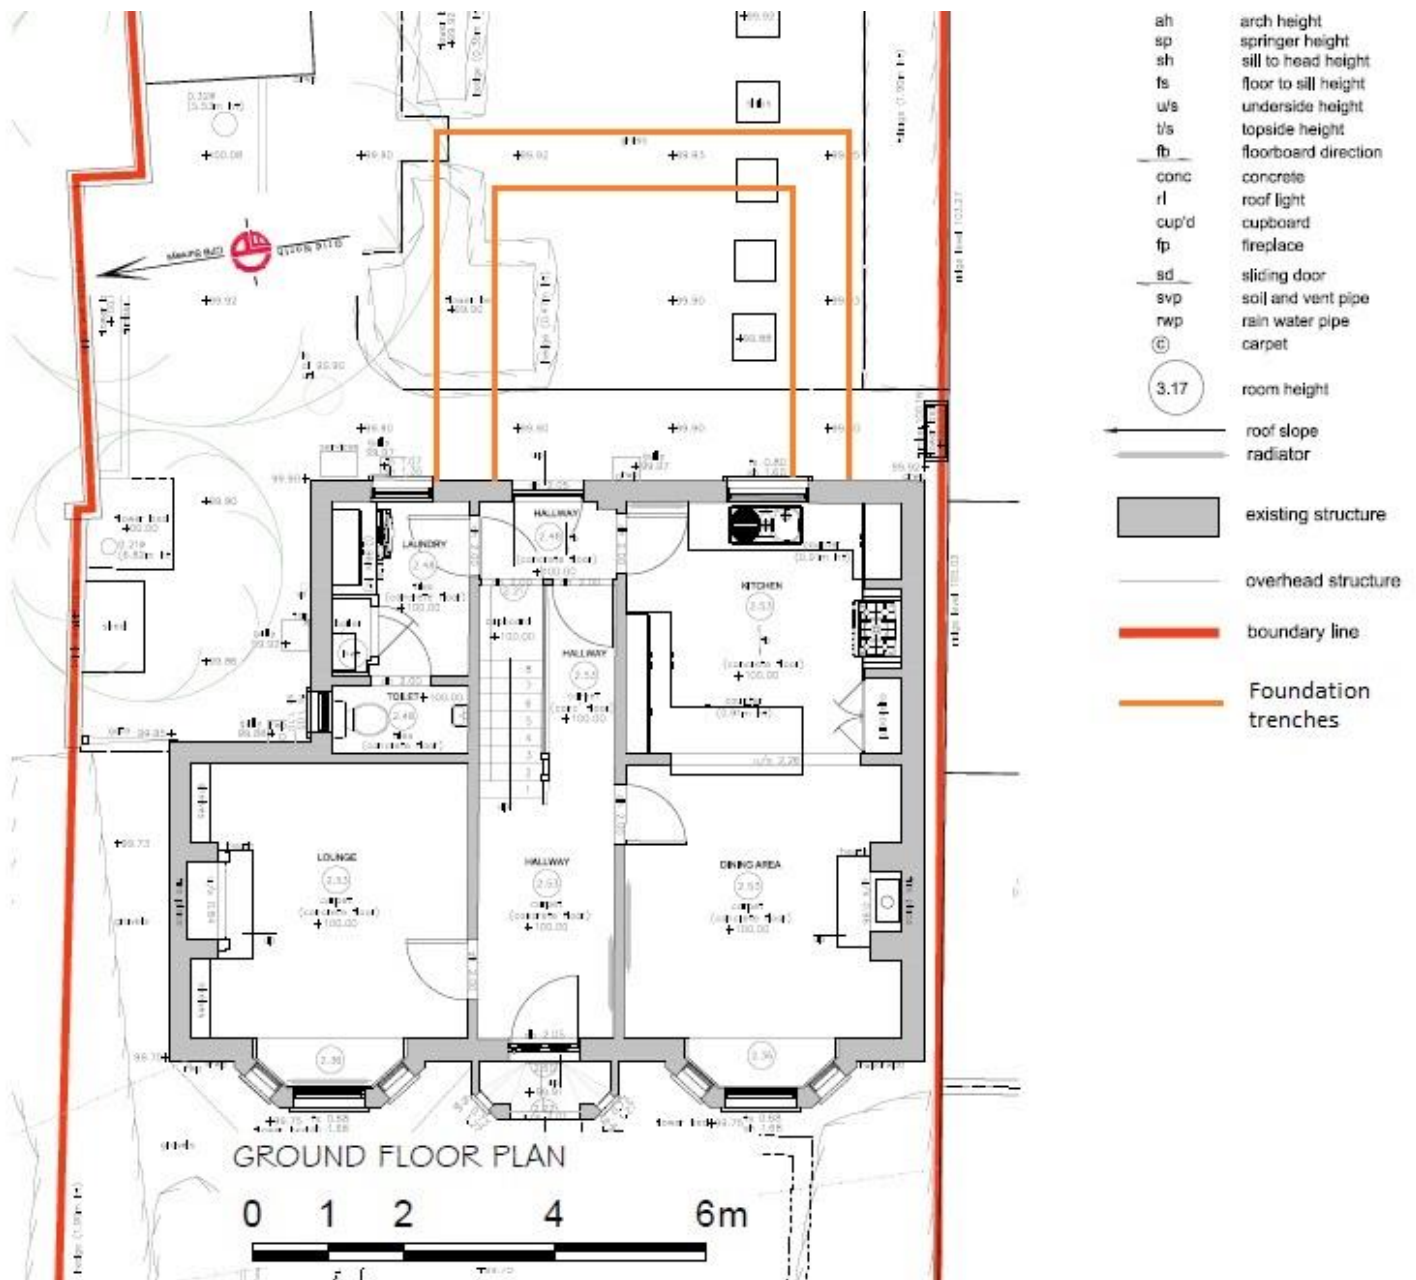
Detailed trench plan, based on Marble Air drawing MA20-004 PL200, scale 1:100. The levels are to an arbitrary site datum, not Ordnance Datum. The straight line running north-south just to the east of the rear wall marked the edge of a paved area – drain 6/8 was exactly under this.
